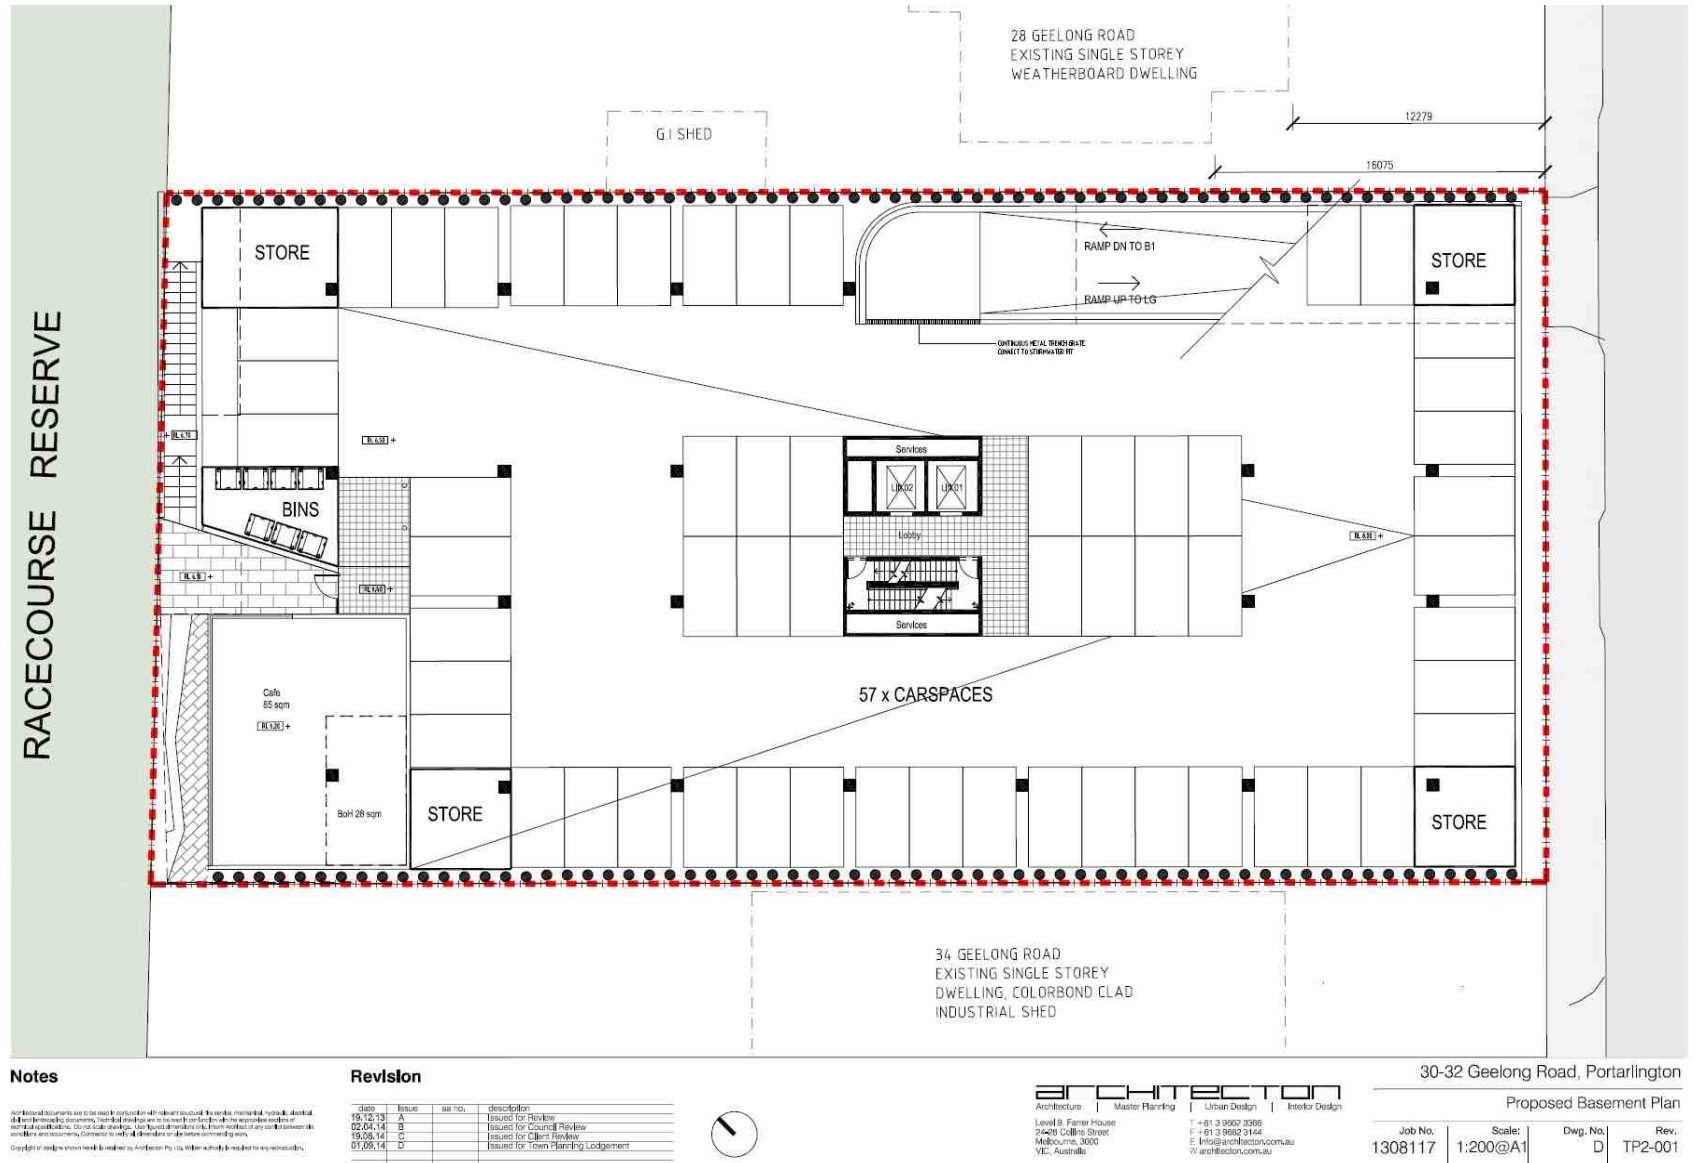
Proposed Sub-Ground Car Park – 30-32 Geelong Road Portarlington
